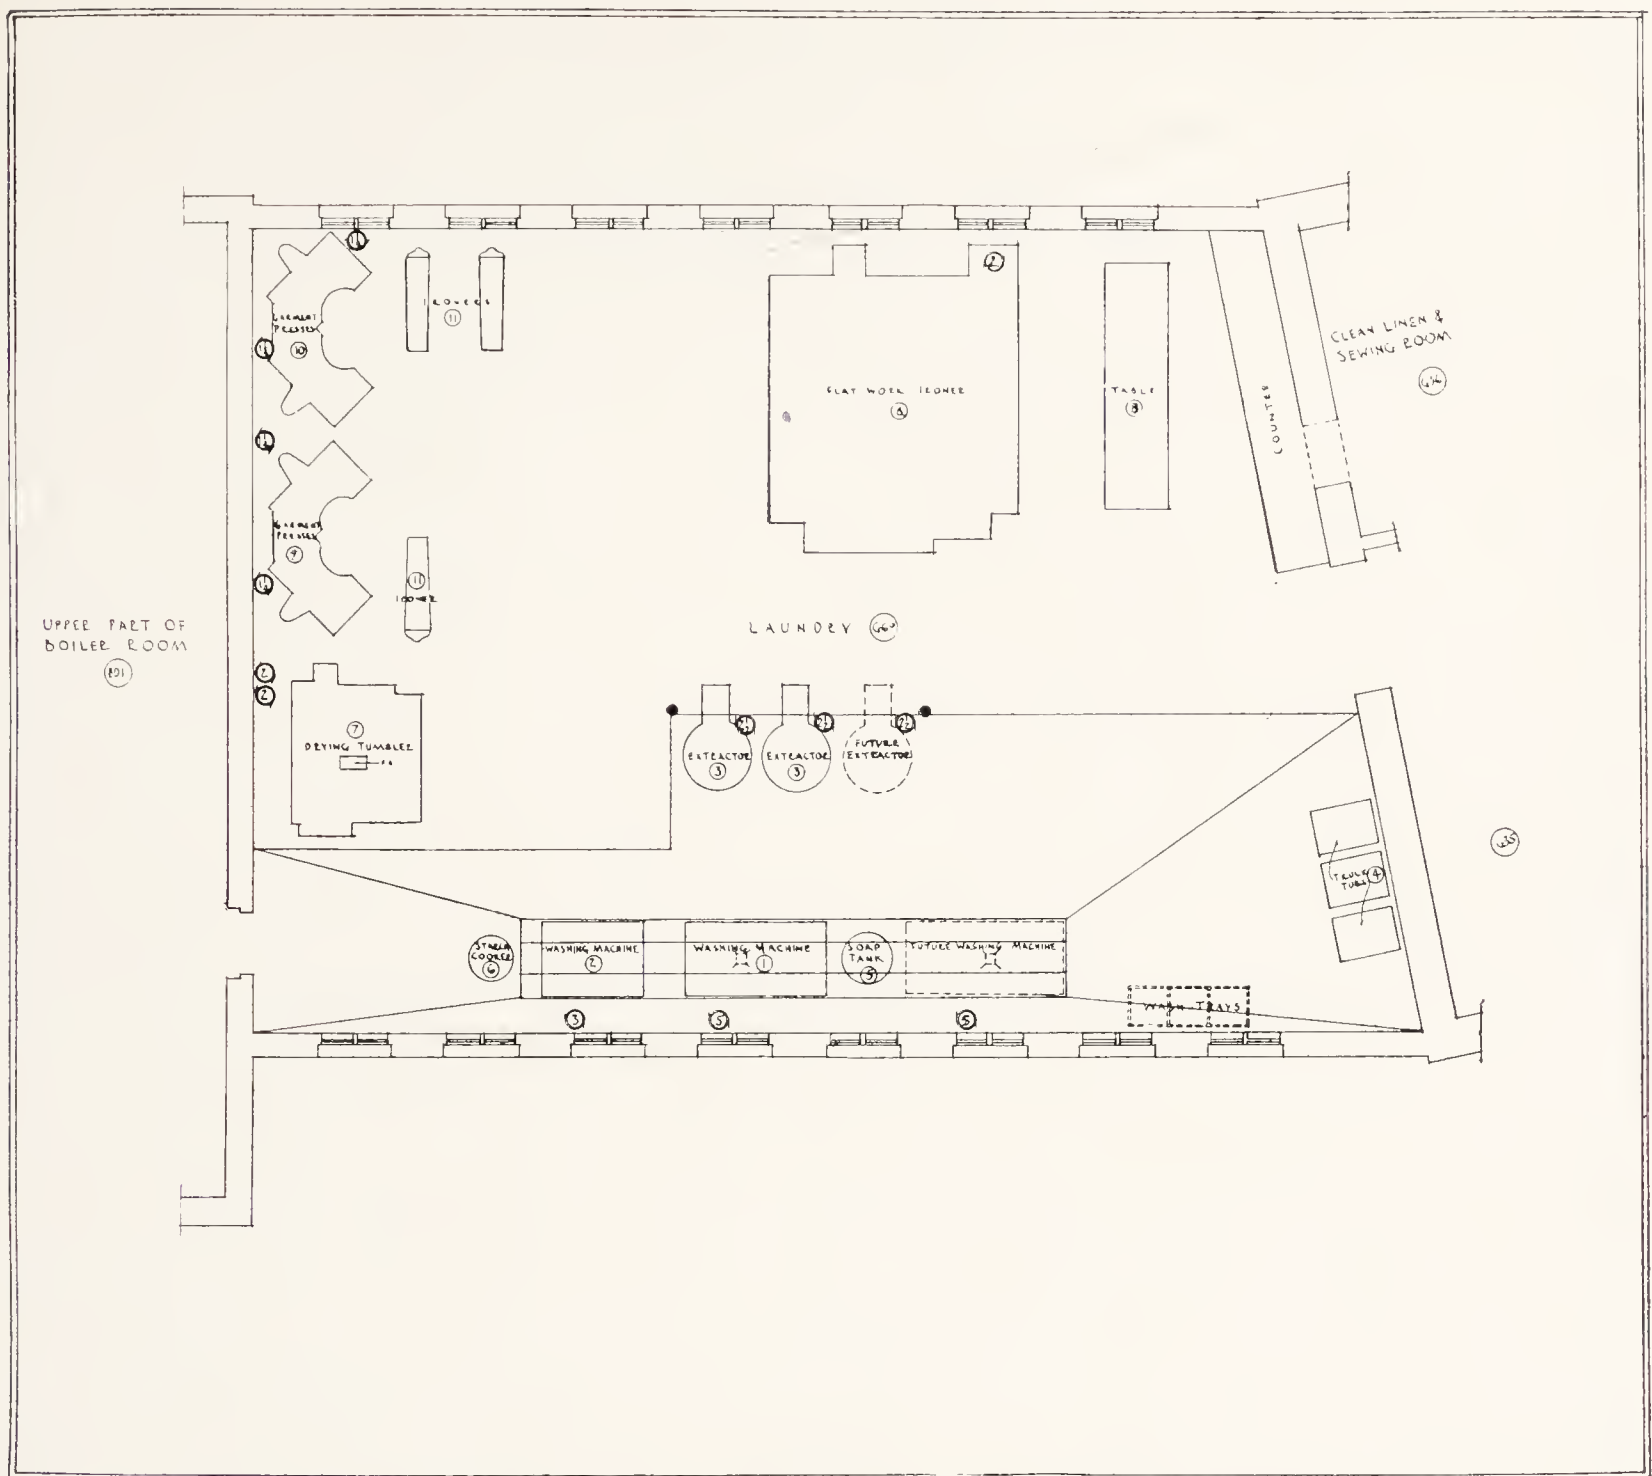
PLAN OF LAUNDRY, PROVIDENCE LYING-IN HOSPITAL, PROVIDENCE, R. I.
